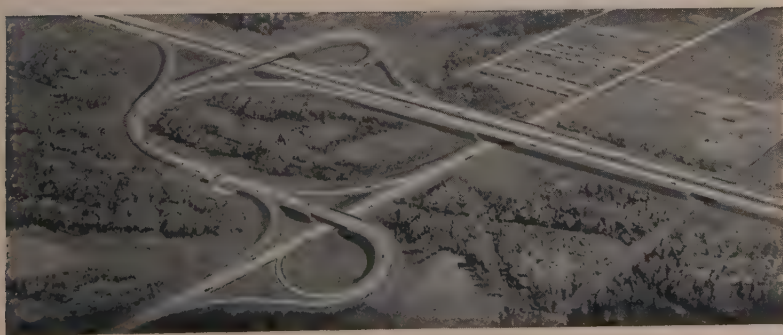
A TYPICAL INTERCHANGE AT JUNCTION WITH NEW JERSEY TURNPIKE
